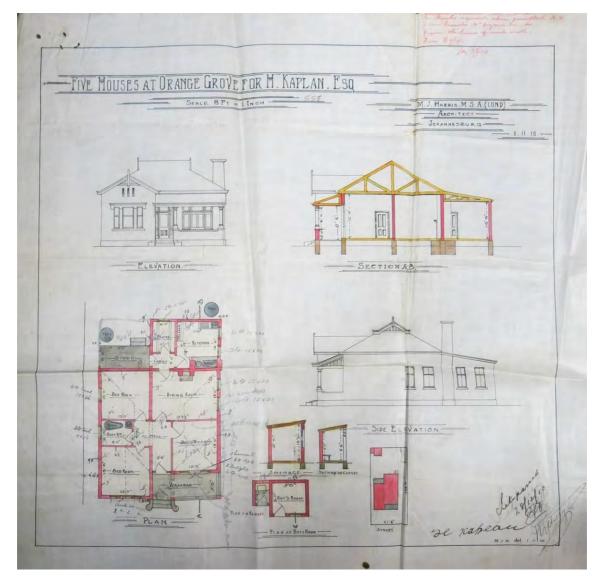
Plan for five houses in Orange Grove, 1910 Originally designed with one sided triangular gable along the main façade (Source: City Council of Johannesburg, Plans Archive)
